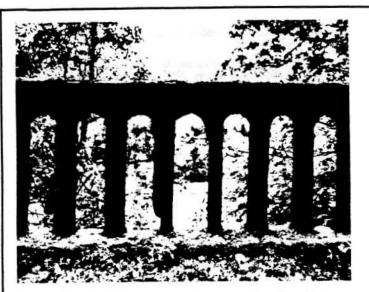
The spindle-type railings were deteriorated beyond repair. The concrete was cracked or broken and the center reinforcing rods were exposed and badly rusted.
